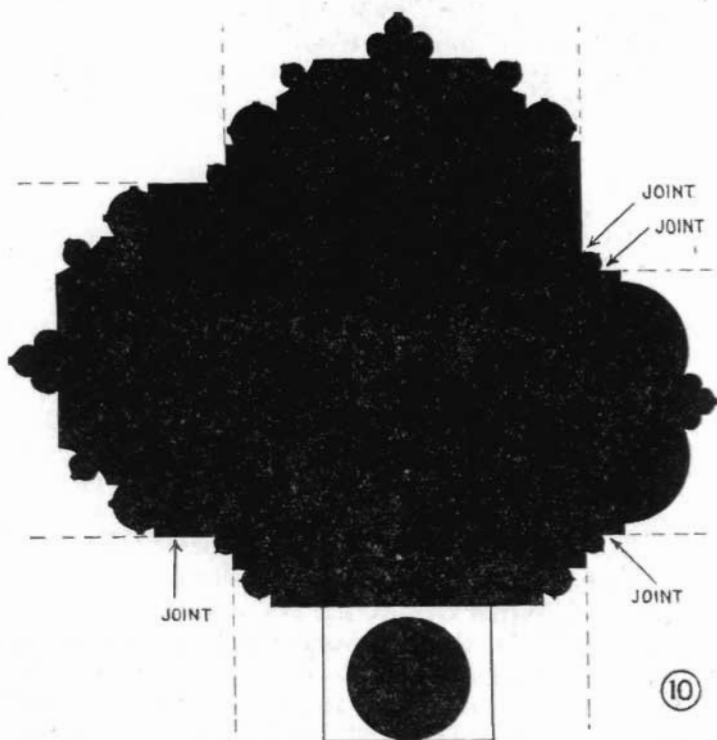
CROSSING. PLAN OF SE. PIER ($\frac{1}{40}$).
